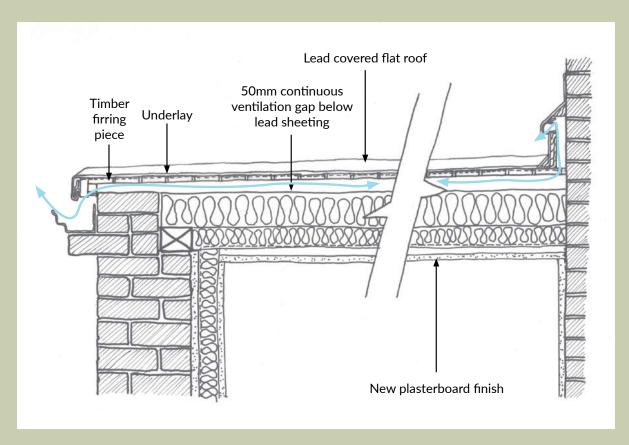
A section through a typical traditional flat roof showing how it might be thermally upgraded
